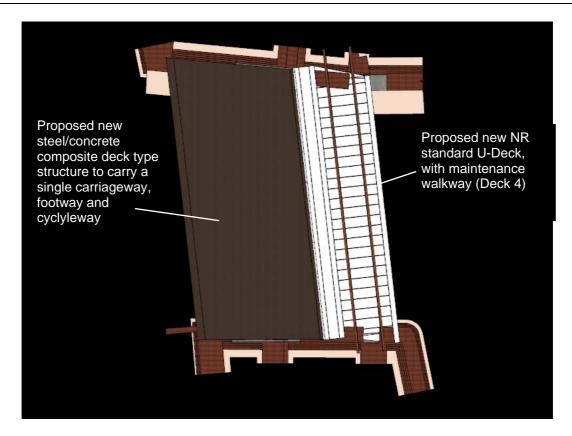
Sheepwash Bridge, plan on proposed decks 4 and 5
